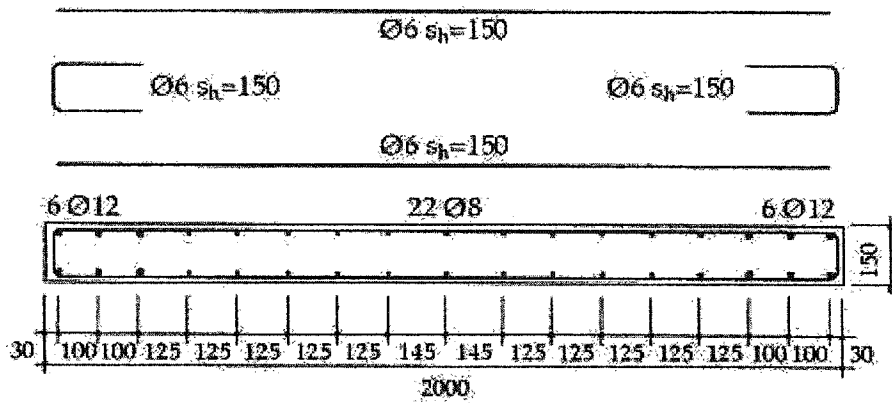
Reinforcement details of WSH14 (after Dazio et al., 1999)
